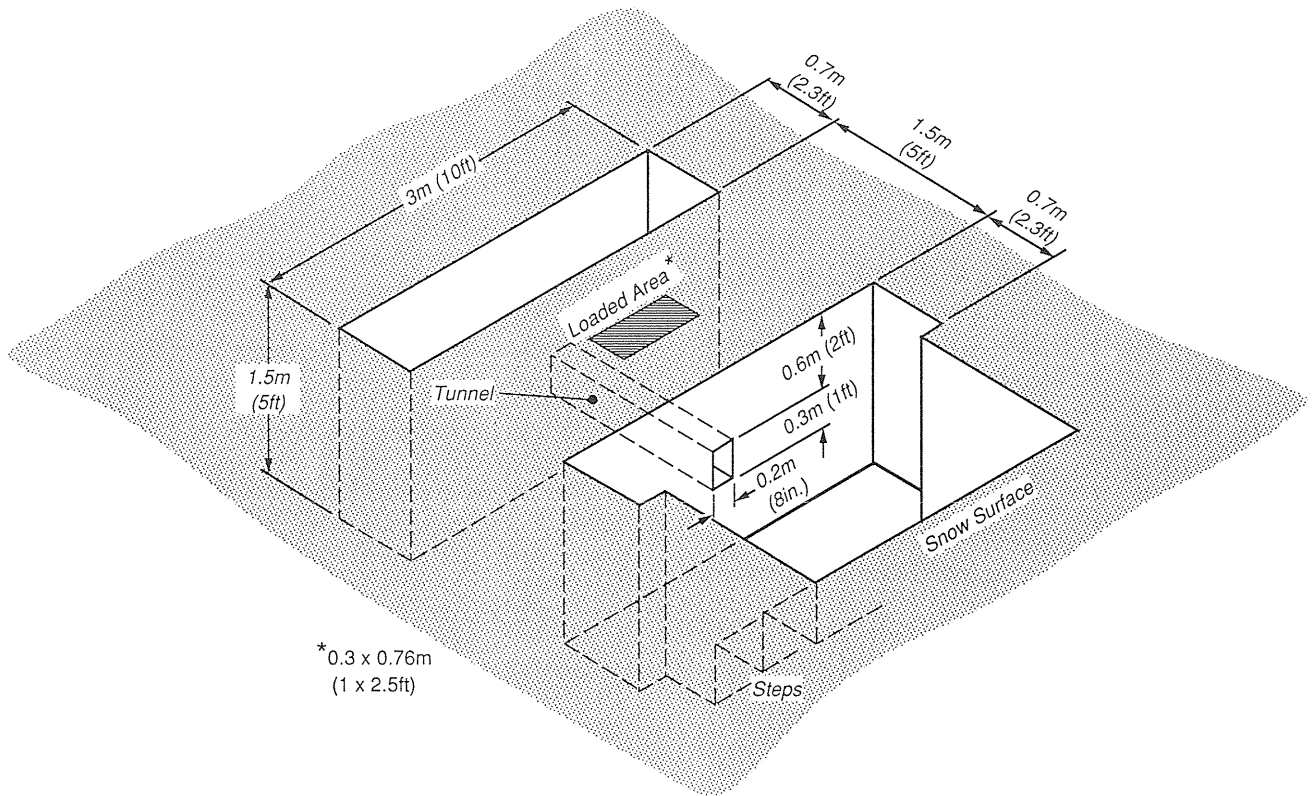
Sketch showing the tunnel and the loading surface for the 1/10 scale model.
